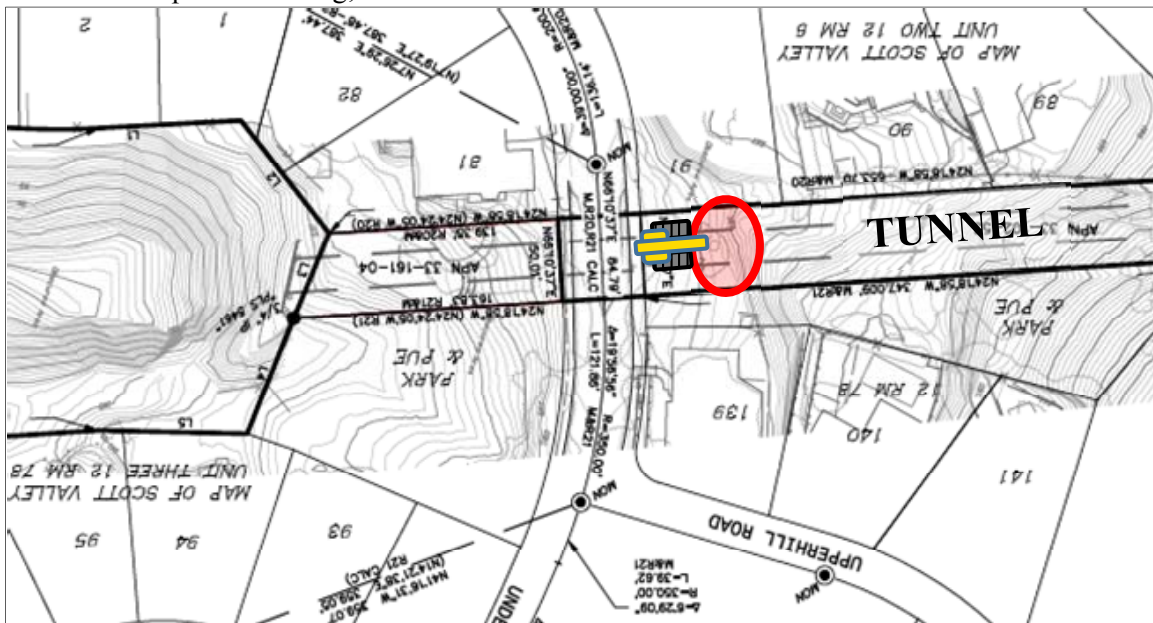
Drill rig and borehole locations above Alto Tunnel at the Underhill Road project site.
